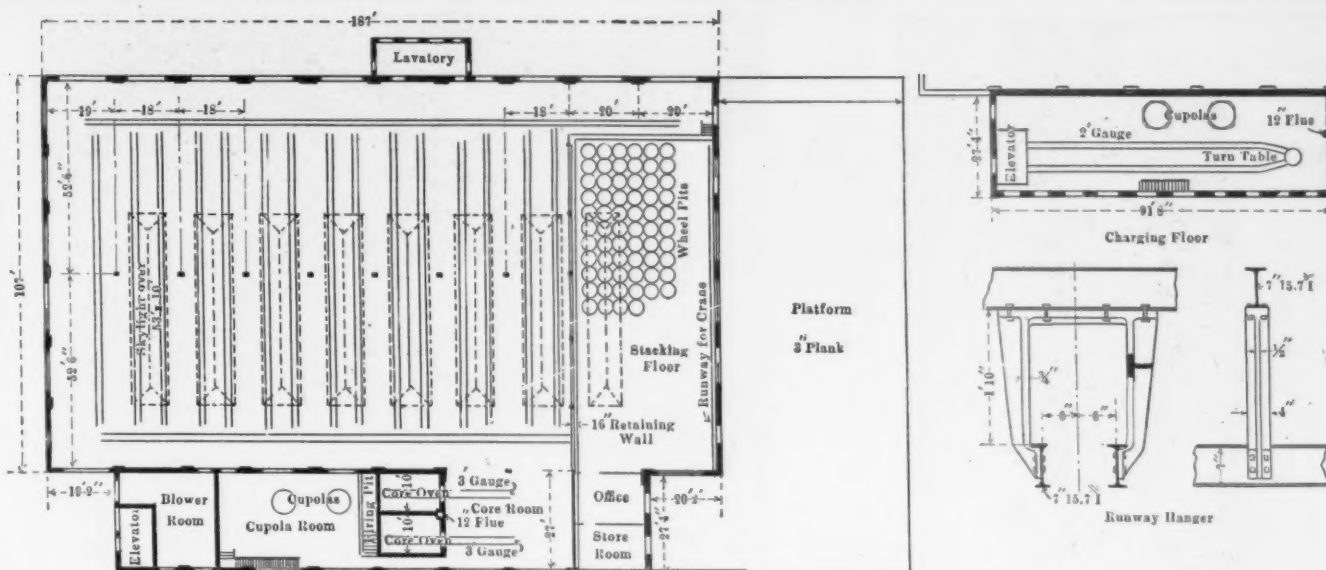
FLOOR PLAN OF WHEEL FOUNDRY.
